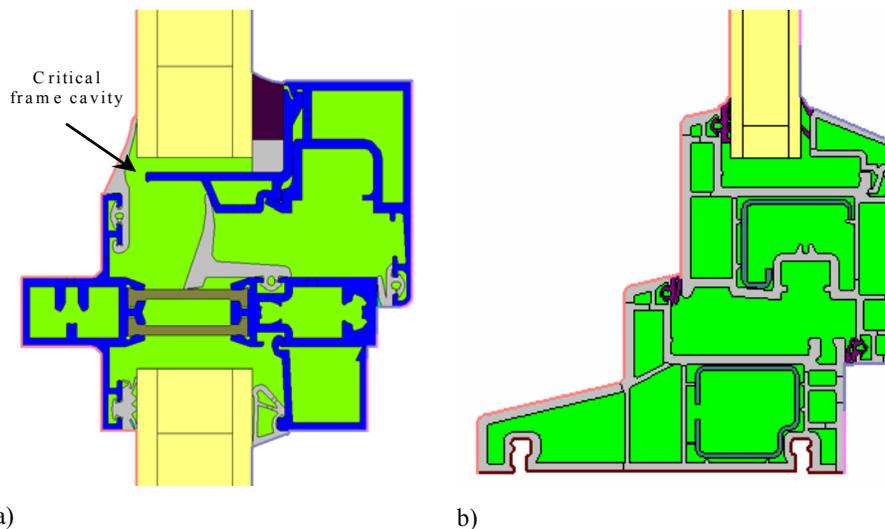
Cross-sections of frame profiles of aluminium (a) and PVC (b).
